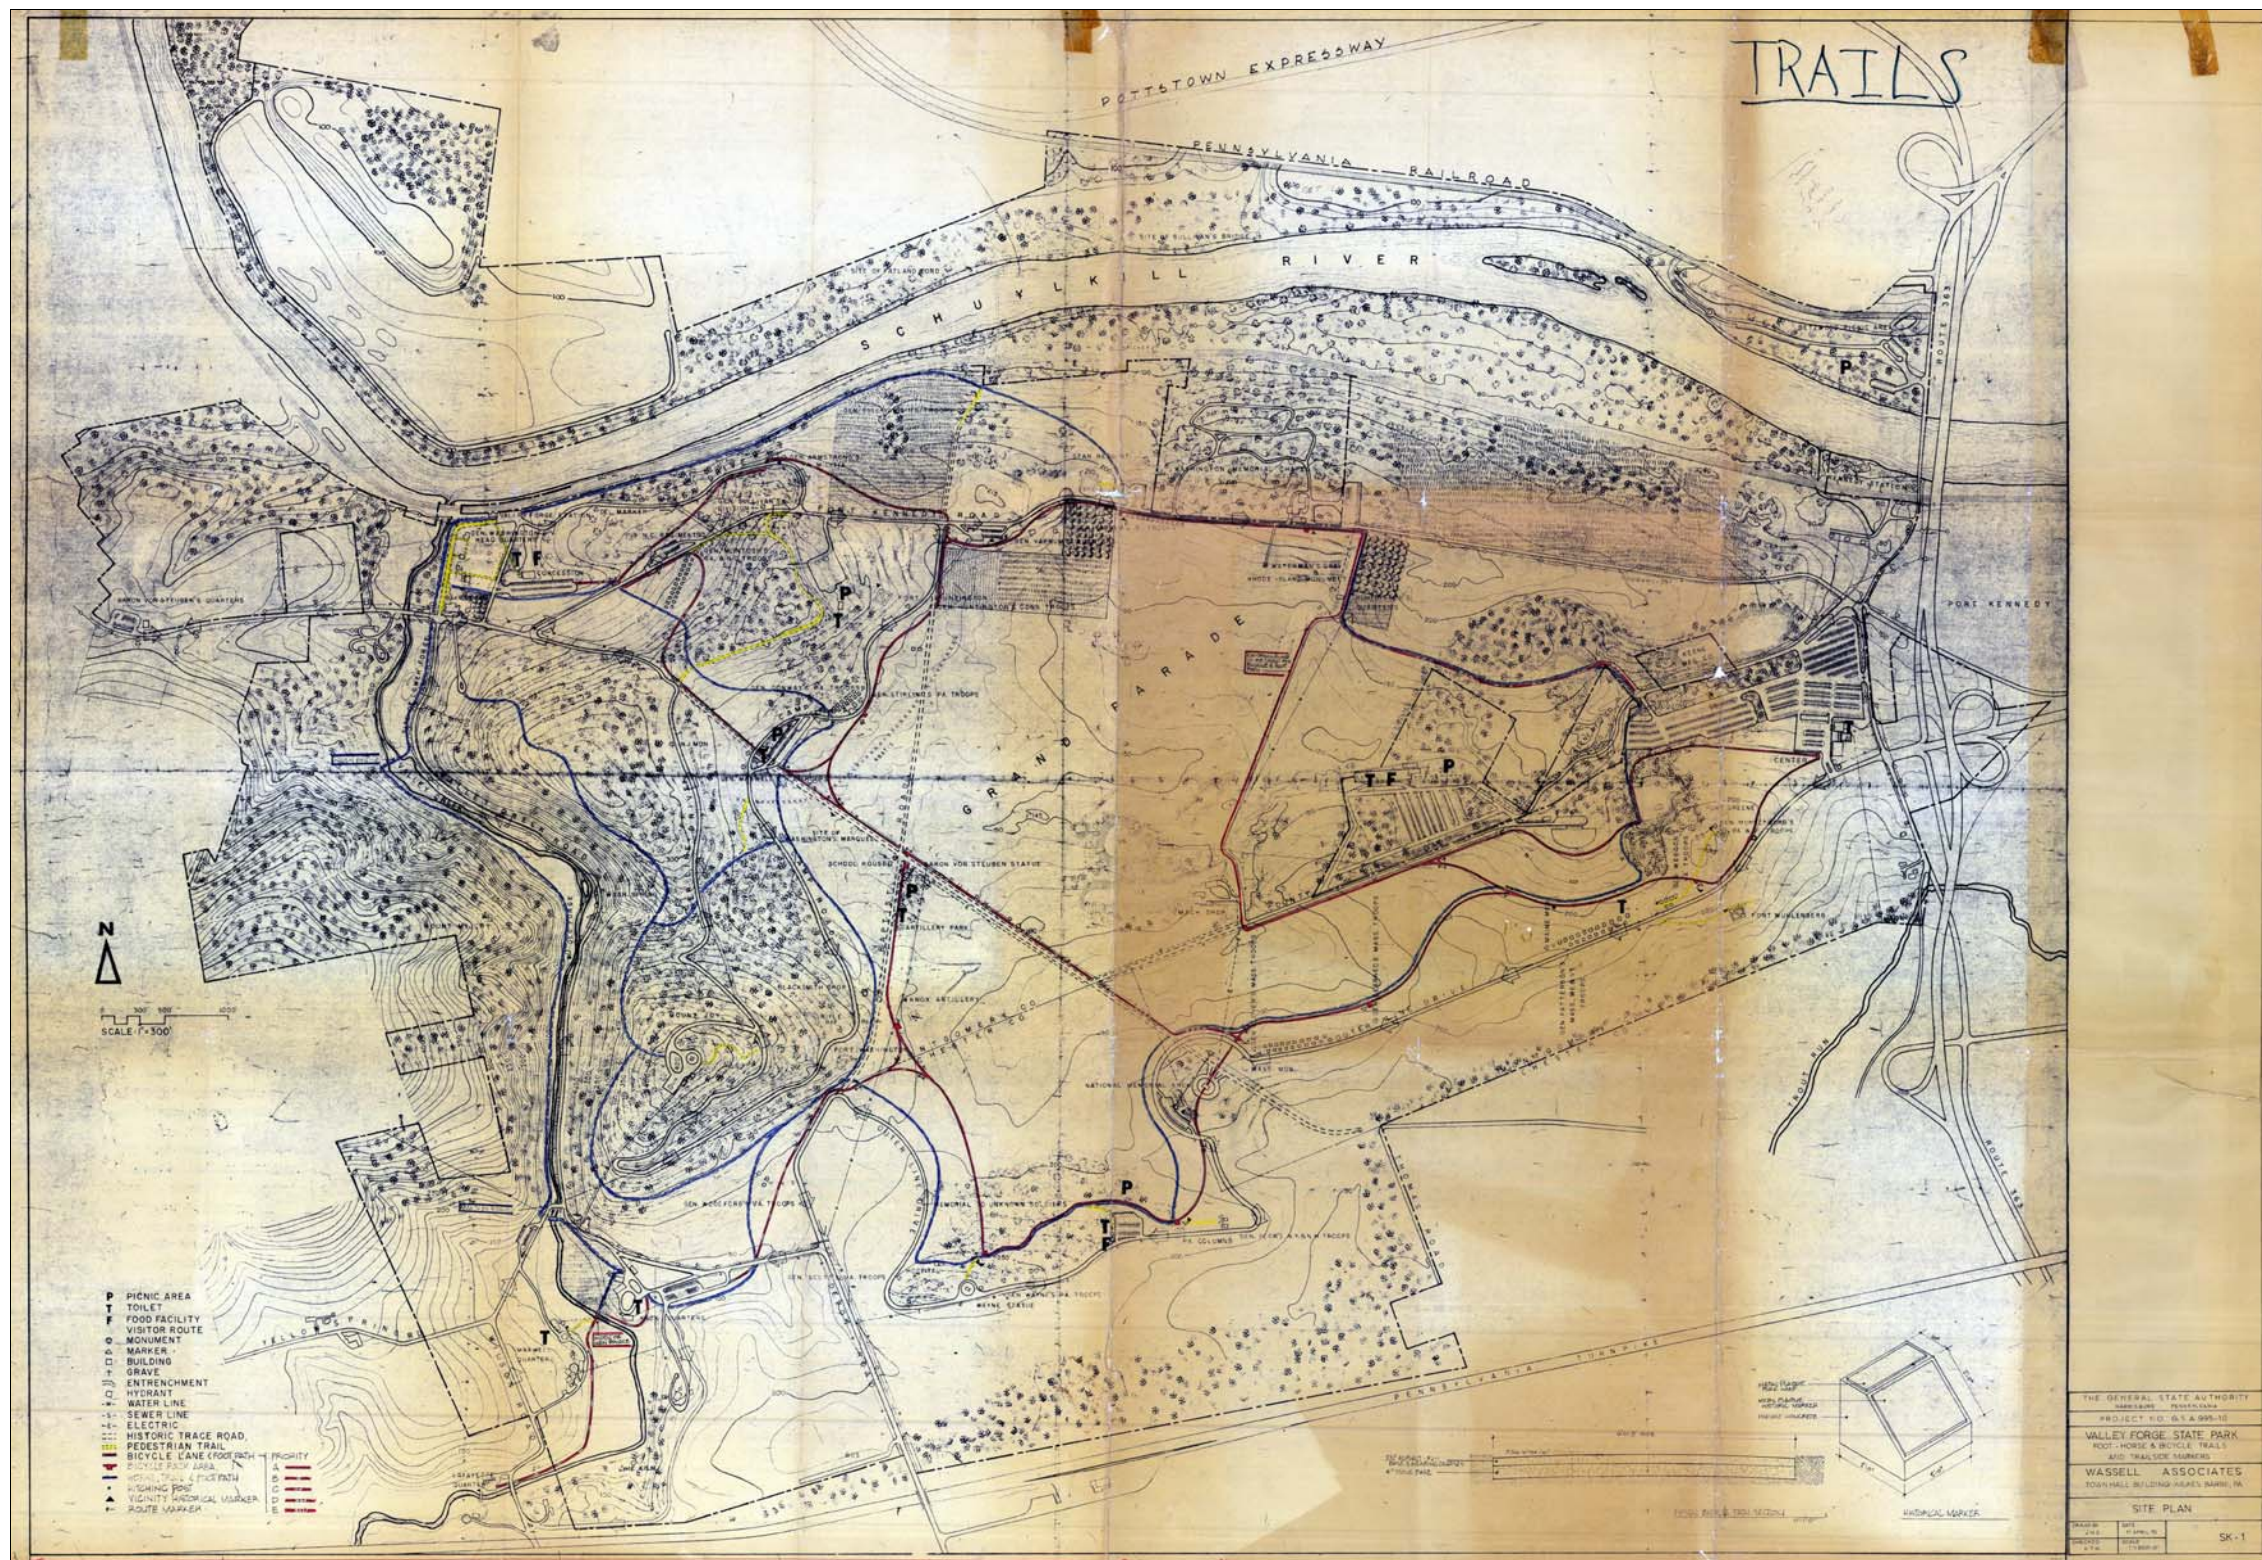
Plan showing *Construction of Foot - Horse and Bicycle Trails and Trailside Markers, Site Plan*, by Wassell Associates Architects, April 11, 1975 (VAFO Archives).
